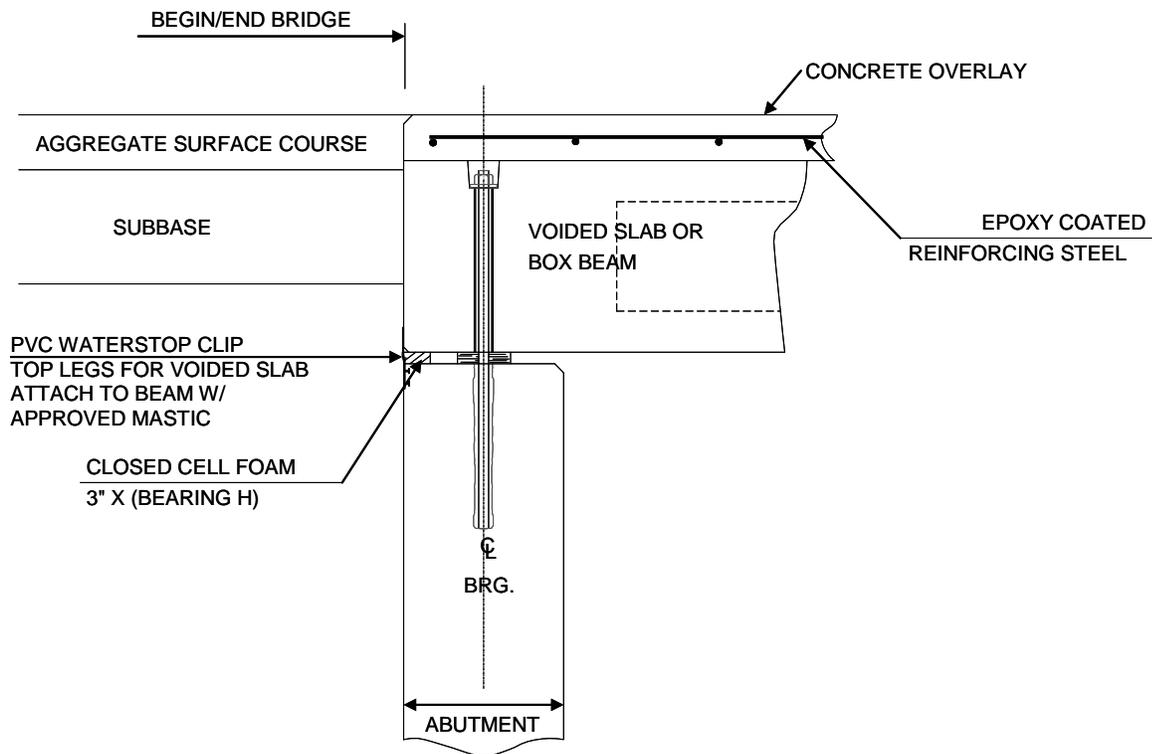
2 Voided Slab and Box Beam Type D Bridge End Detail
